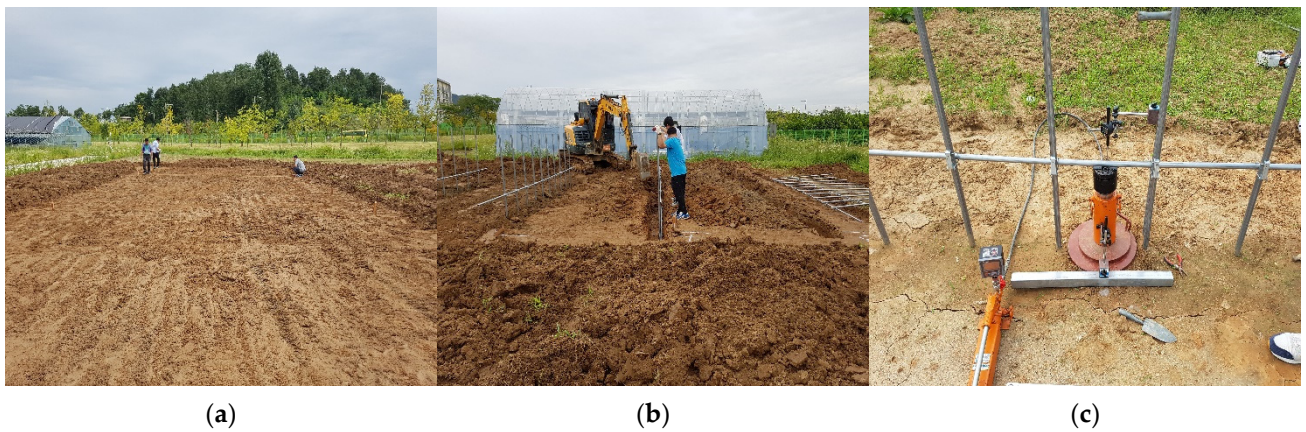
Field static axial tensile load test: (a) installed continuous foundation of site A and (b) installed continuous foundation of site B and site C.
